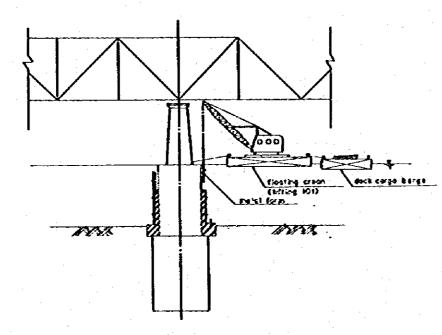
D-Pier Rehabilitaiton Plan No. 2
